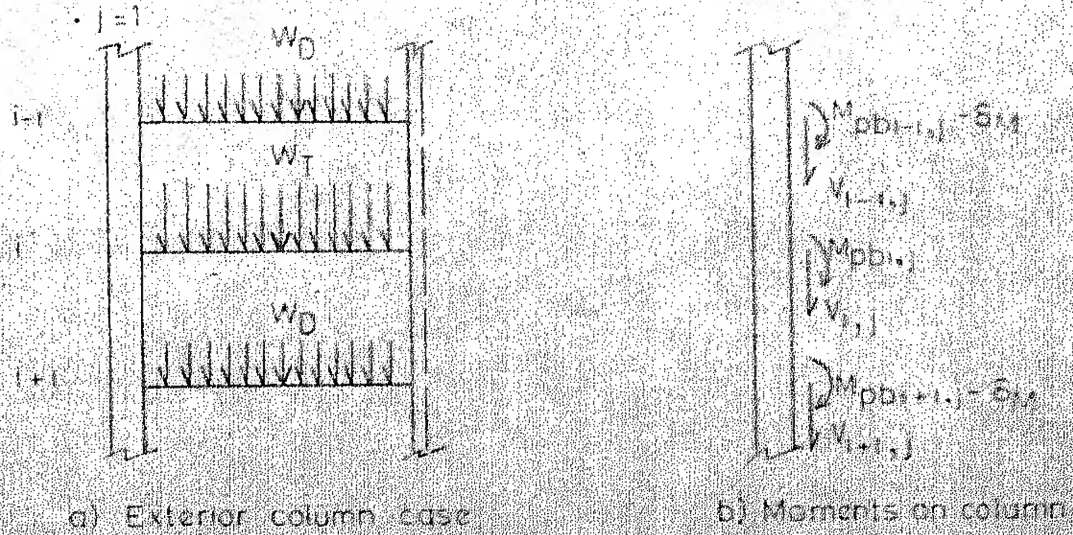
EXTERIOR COLUMN-ALTERNATE SPANS LOADED
